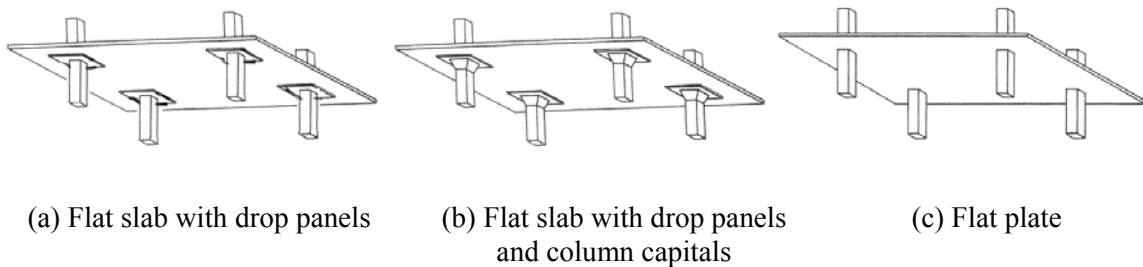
Classification of flat slab construction (Park and Gamble, 2000)
